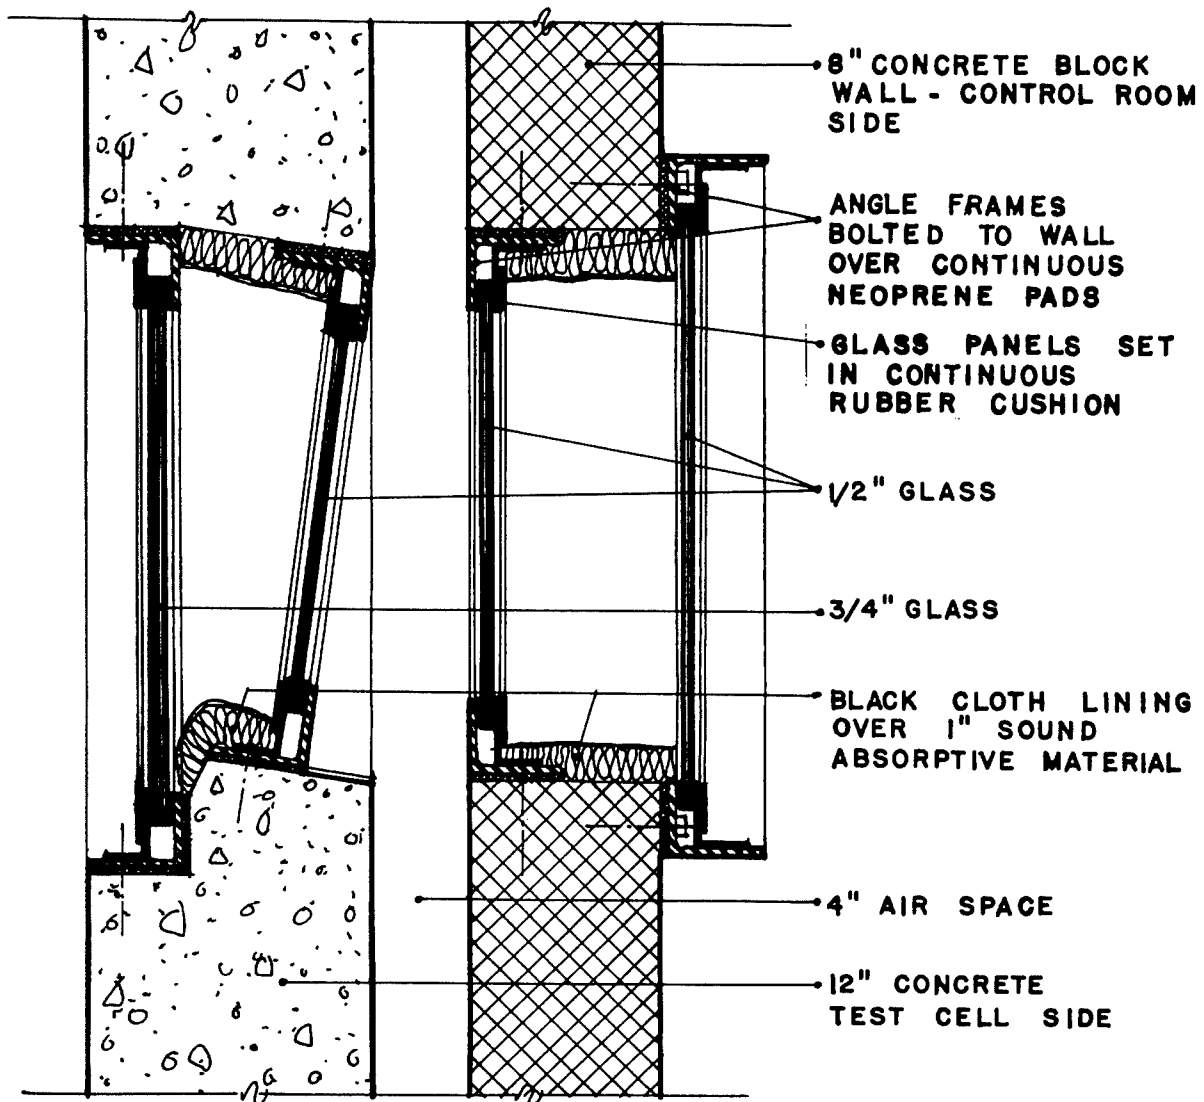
shows details of the Control Room walls. These walls are of lighter construction, but the comments made for the Anechoic Rooms are also applicable here.
